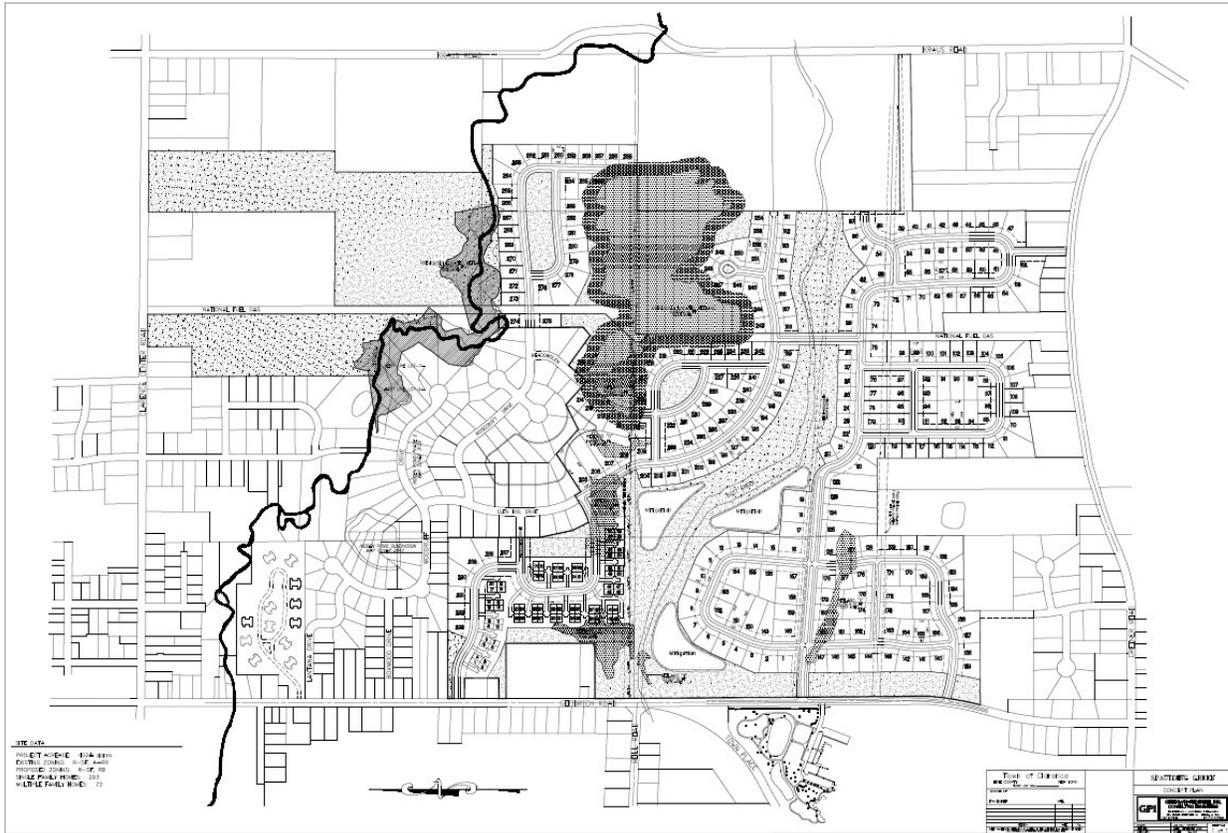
Open Space Design Development Plan, Alternative 1
